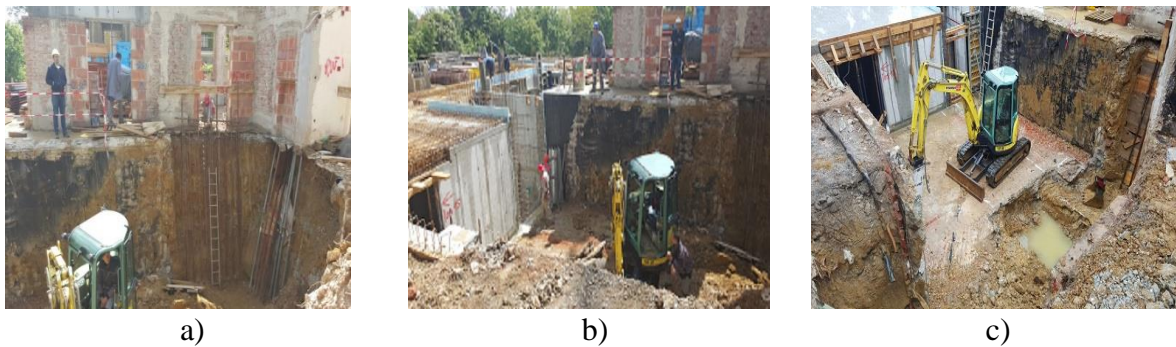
a) cleaning the old walls for preparation for building of the new walls on joints with the old ones b) a newly built basement and a junction with the old wall of the house, c) excavating of the elevators pit
